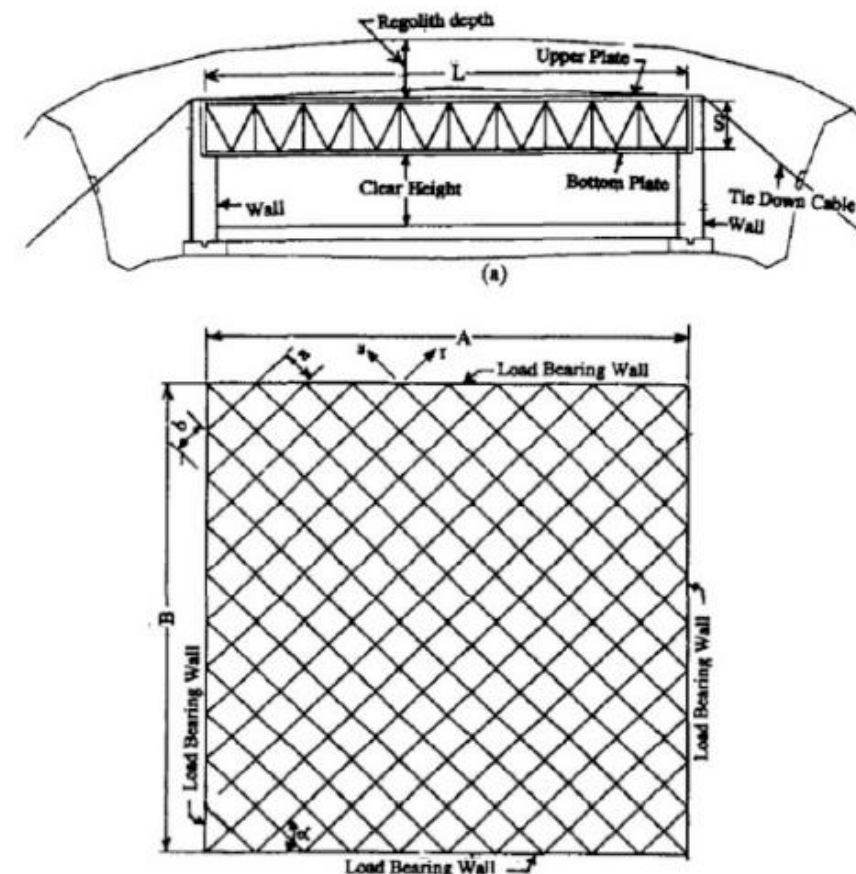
Proposed double-skinned roof structure supporting a regolith cover, Malla et al. [134].
